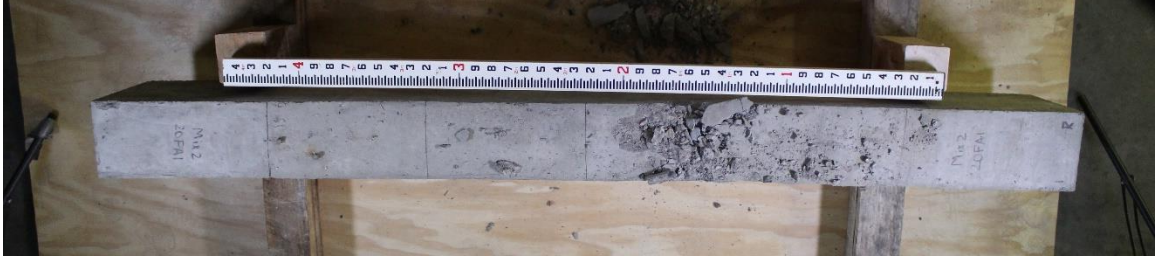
Mixture 2 (20FA1) beam #1R: concrete beam top view.
